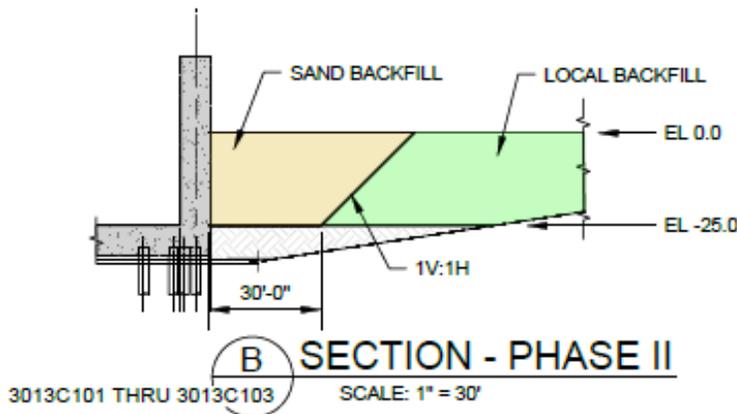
Sand Backfill Adjacent to U-frame and Gated structure Walls – Phase II (shown in yellow)
